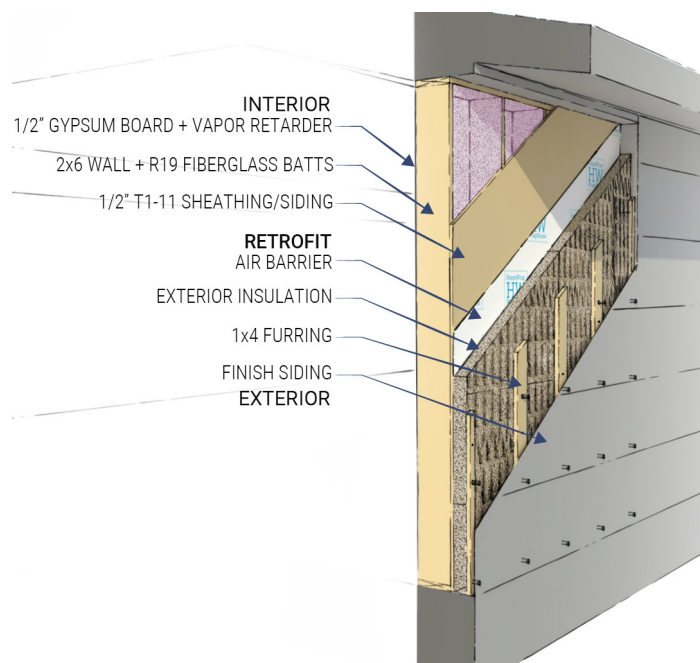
A typical wall retrofit in Fairbanks, Alaska consists of a 2x6 frame wall with a layer of exterior insulation under the siding. The 1x4 furring creates a drainage/ventilation area for any liquid water or water vapor that might get behind the siding, also called a rain screen.
